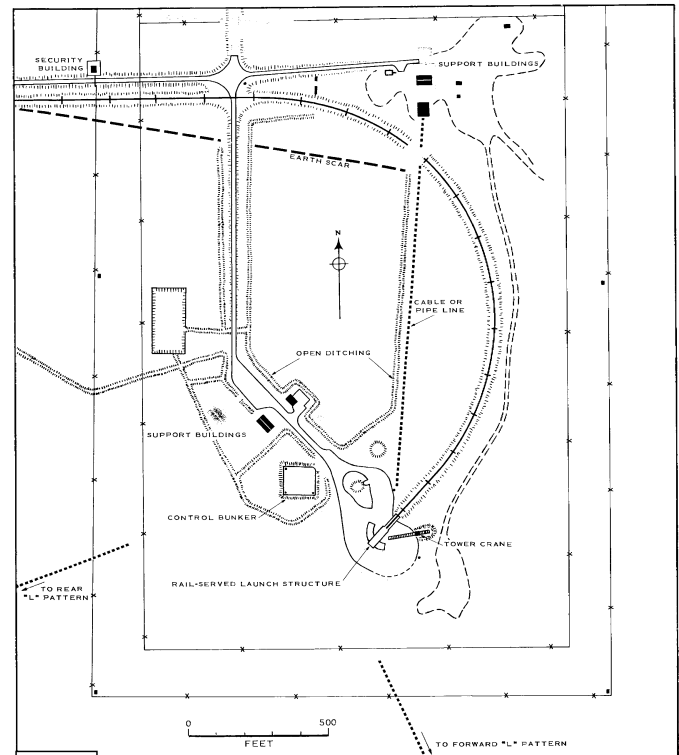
LAUNCH SITE 1D. This is the only rail-served launch site of the Missile Test Center.
